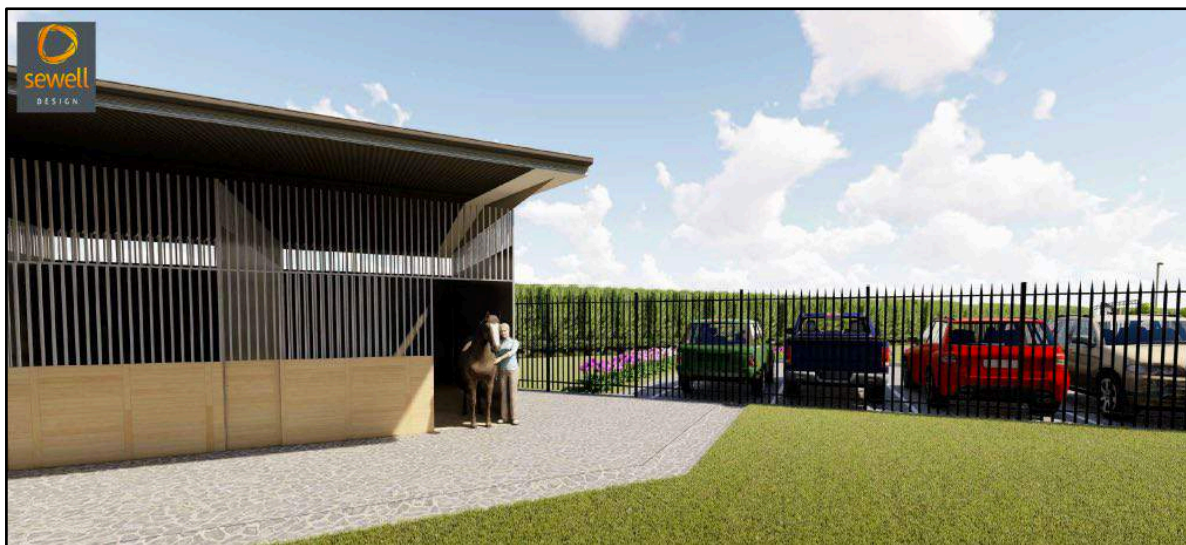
3D image of proposed stables and car parking (Source: Sewell Design 2019)
